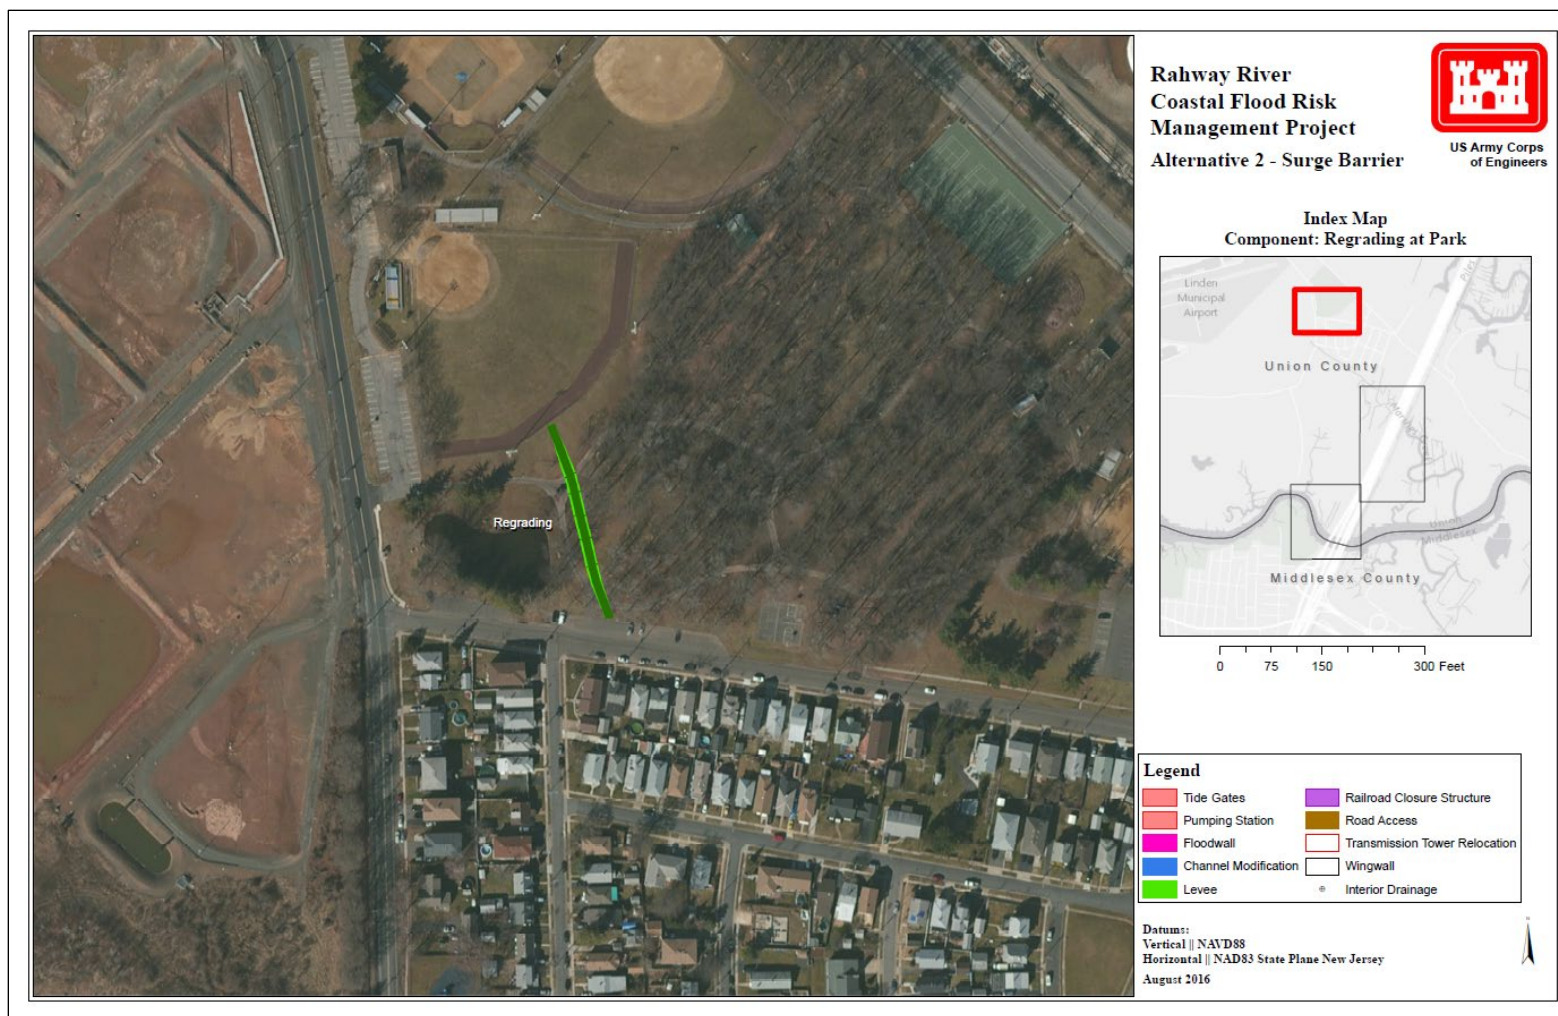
Alternative #2 re-grading at Memorial Field Park layout.
